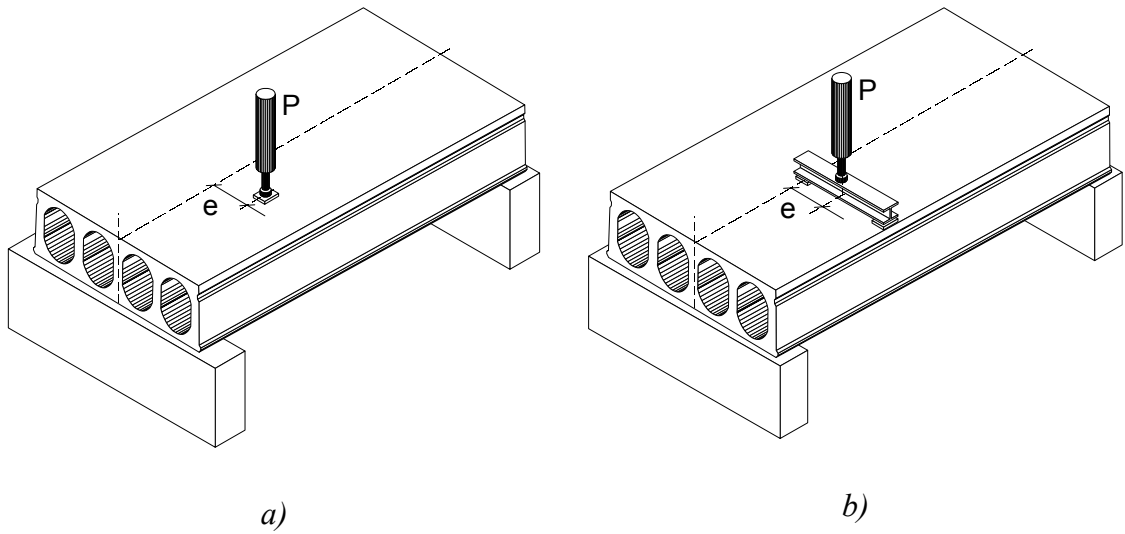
General view on loading arrangements with eccentricity e . a) One point load on slab unit. b) Two point loads on slab unit.
